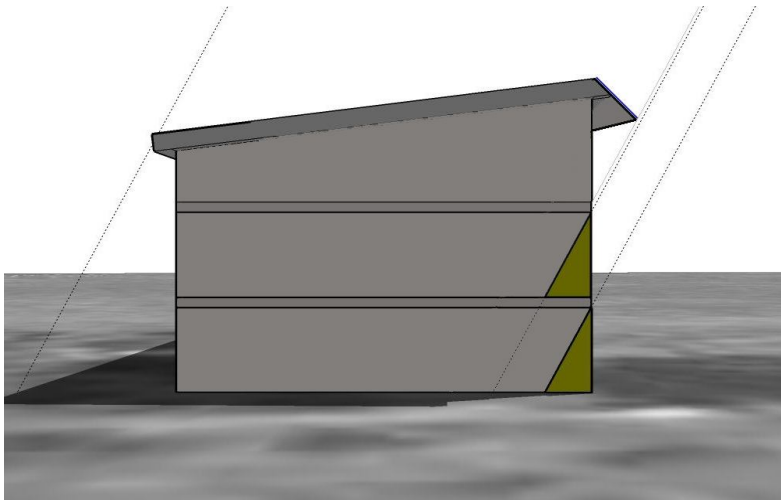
Situation of the shading of the front roof in summer (July 21st)
